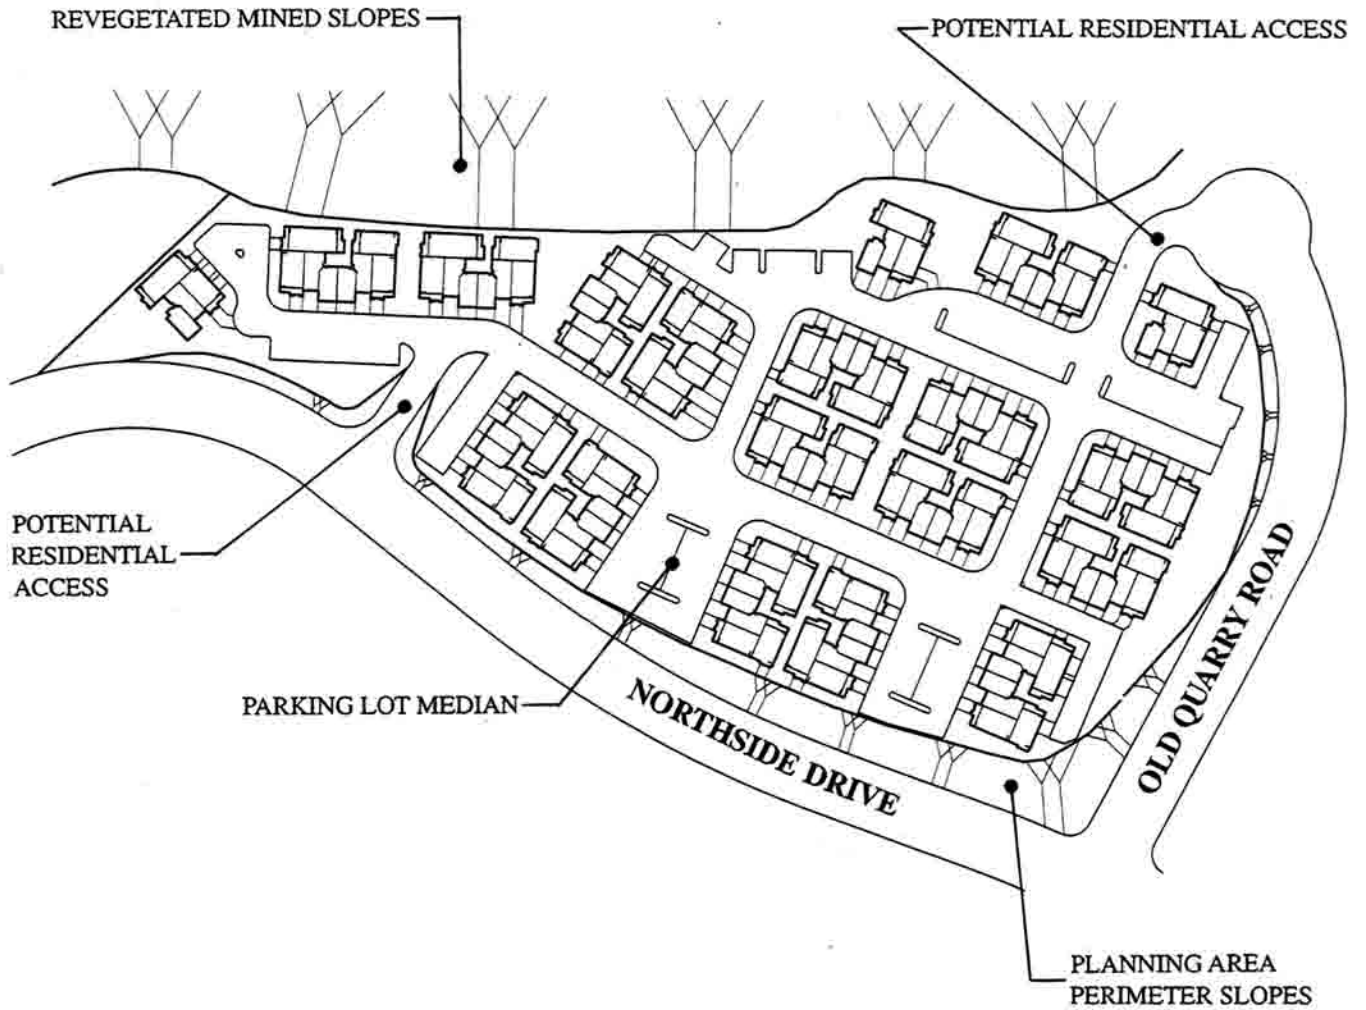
, II-5, II-6, II-7 and II-8 show some of the conceptual building layouts for a variety of residential products which can occur in Planning Areas 2 through 5 for *Mission City North*. Planning Area 2 was used for the design of these conceptual layouts, and it is understood that the actual design for each planning area may vary. Planning Area 1 covers a portion of *Mission City* where lots have been recorded in accordance with the Northside Specific Plan. Development within this area can proceed prior to approval of the *Mission City* Specific Plan in accordance with approved building permits.
